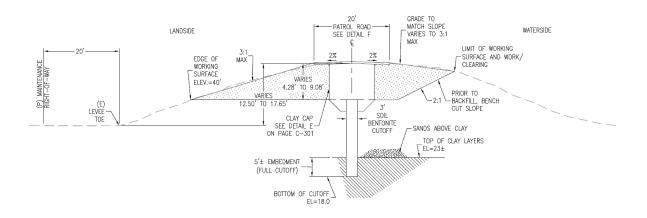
Typical USACE Cutoff Wall Cross-Section Mid-Valley Sites
